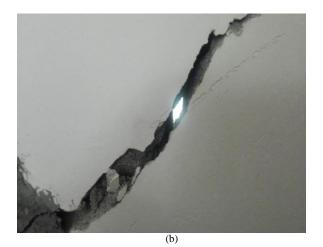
Settlement cracks in customs buildings at new Islamabad Airport
